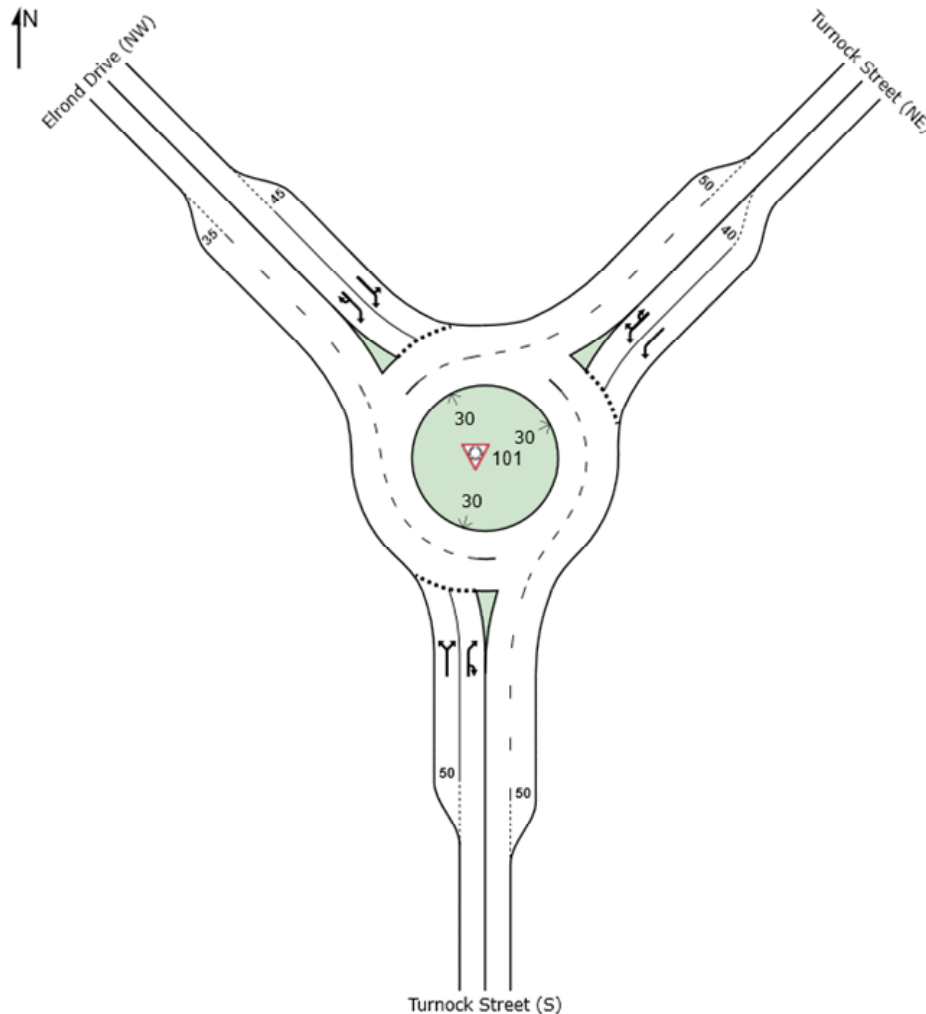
Turnock Street / Elrond Drive SIDRA Intersection Layout
